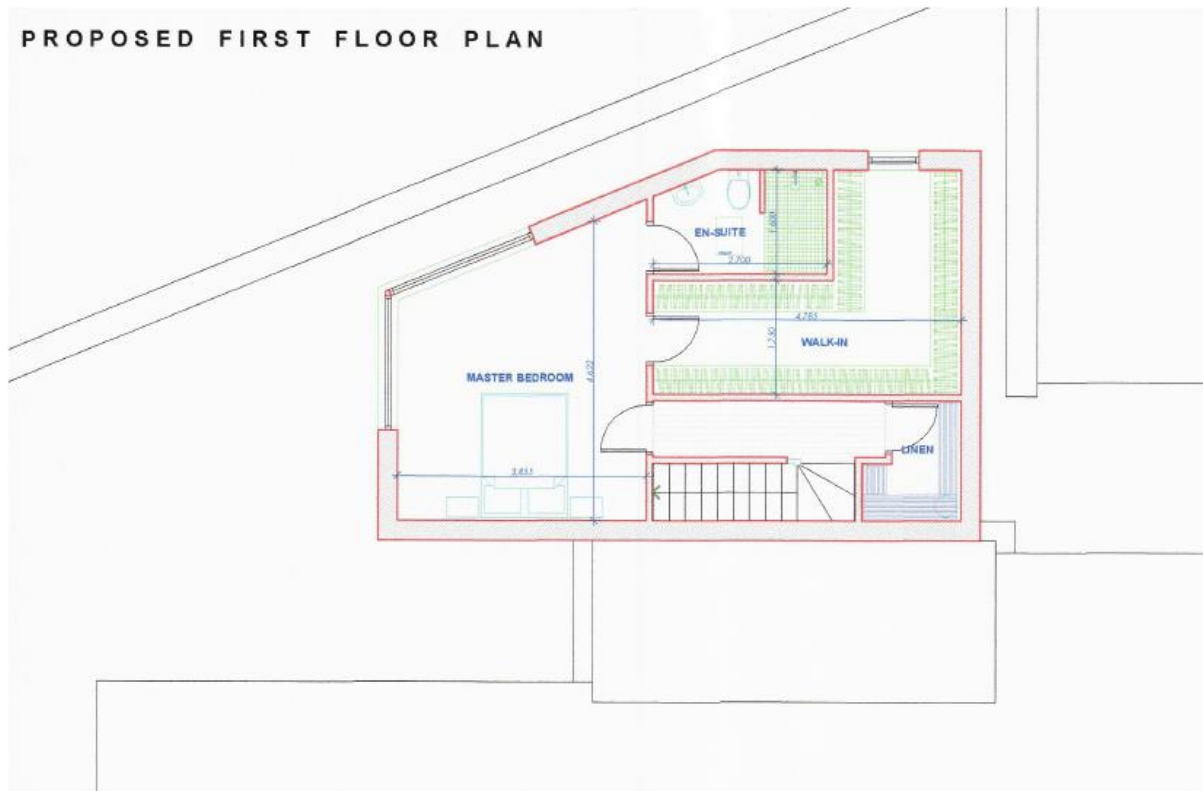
Proposed upper floor in apartment showing bedroom, en-suite and walk in wardrobe
